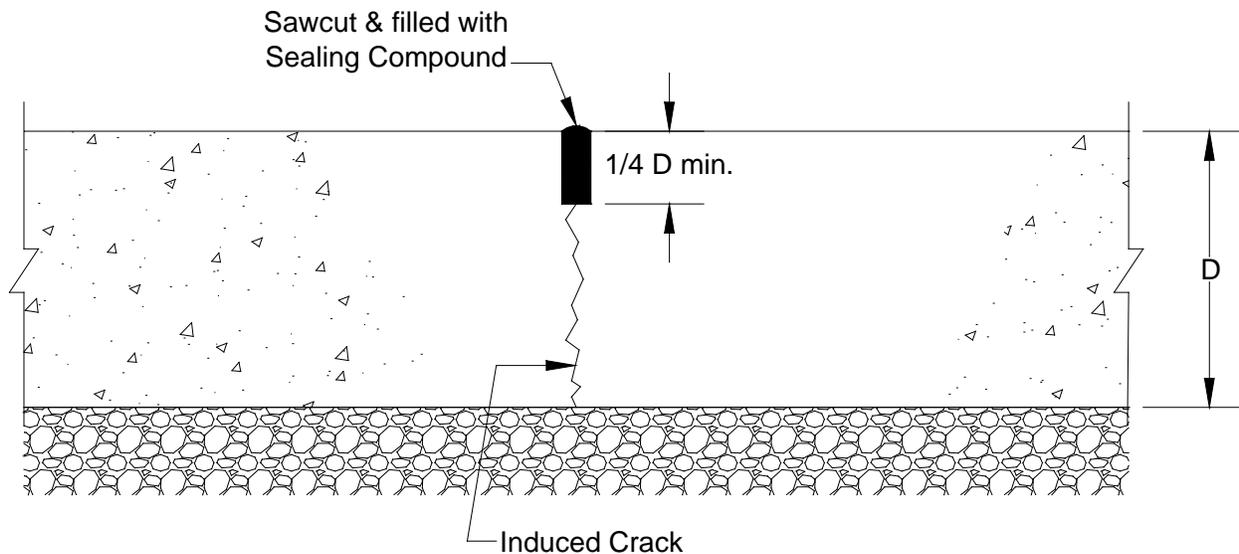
Contraction joint cut into a concrete alley and filled with a flexible liquid sealer.
